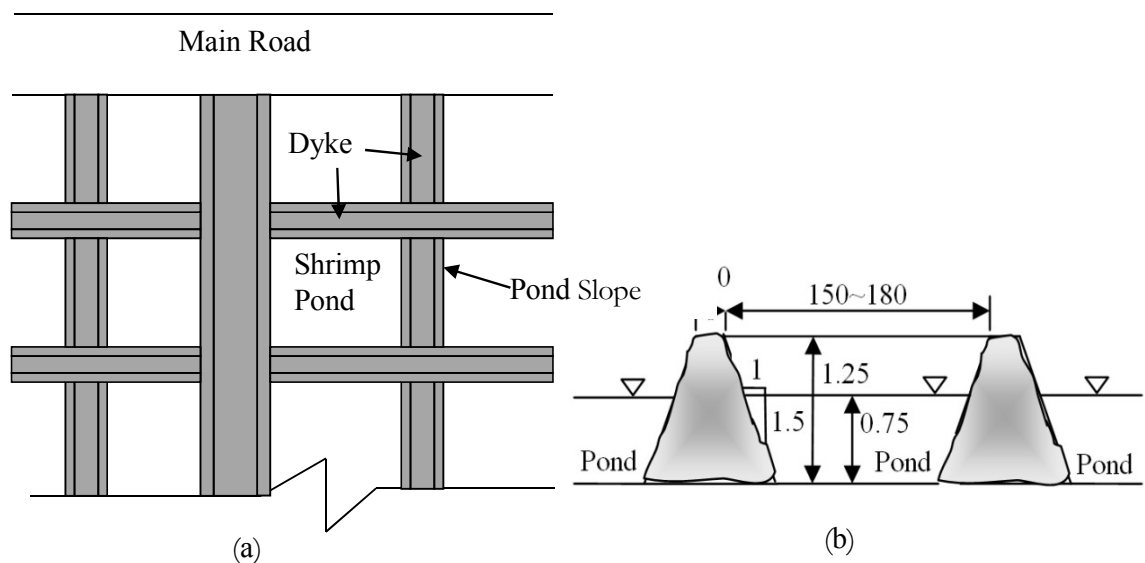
Schematic diagram showing dyke of shrimp cultivation pond (a) Plan and (b) Section (dimensions are in meter)
